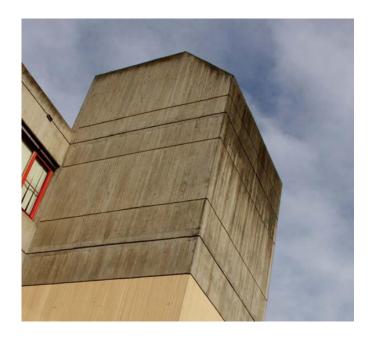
Detail showing off form concrete construction at scale. Source: Diahne Sullivan, 2012.
